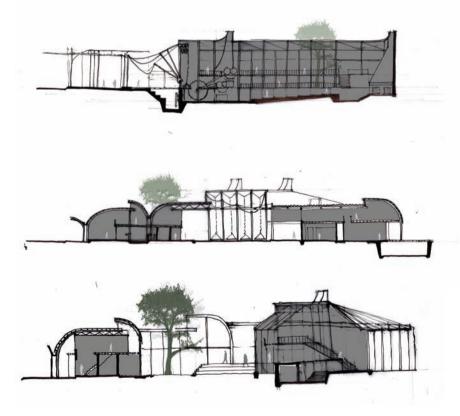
Section through spruit and brewery, June 2013 (Source: Author)
